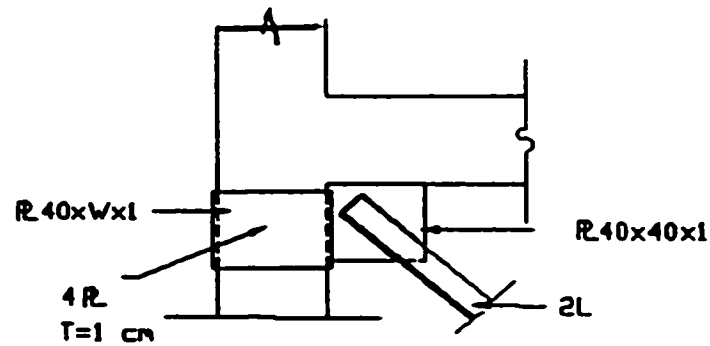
Connection details of steel X-bracing system inserted in the openings of RC frame (Nateghi, 1994)
